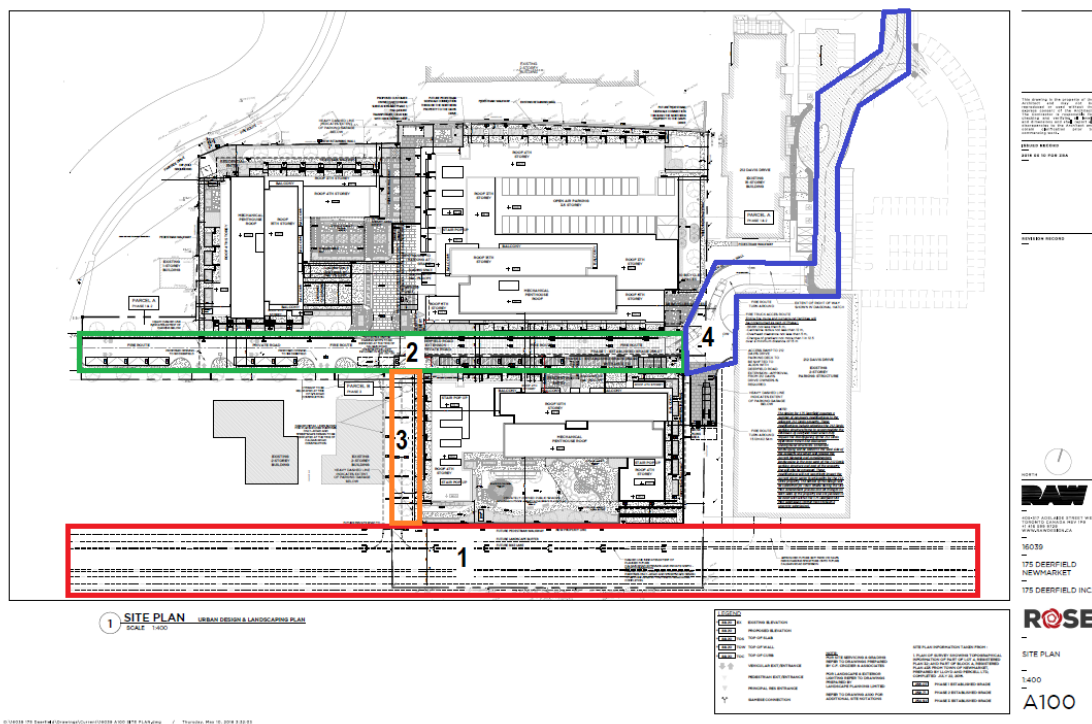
generally illustrates the planned road network. The applicant proposes to meet the street network policies of the UCSP. The conveyance of lands at the south of the subject lands for the future extension of Calgain Road is in line with the Town’s expectations (indicated as 1 on Figure 6). Note that only the portion of the future Calgain extension within the subject lands is to be conveyed and existing private property exists to the west that has not been acquired by the Town.
